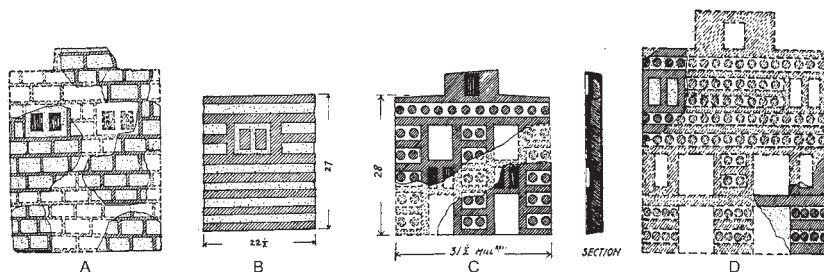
Knossos. Faience plaques of the “Town Mosaic”: A) ashlar masonry B) horizontal timber reinforcements of rubble or mudbrick masonry C) composite masonry of rubble or mudbrick with piers composed of horizontal timber frameworks D) masonry composed entirely from horizontal timber framework (Evans 1921, Fig. 226).
